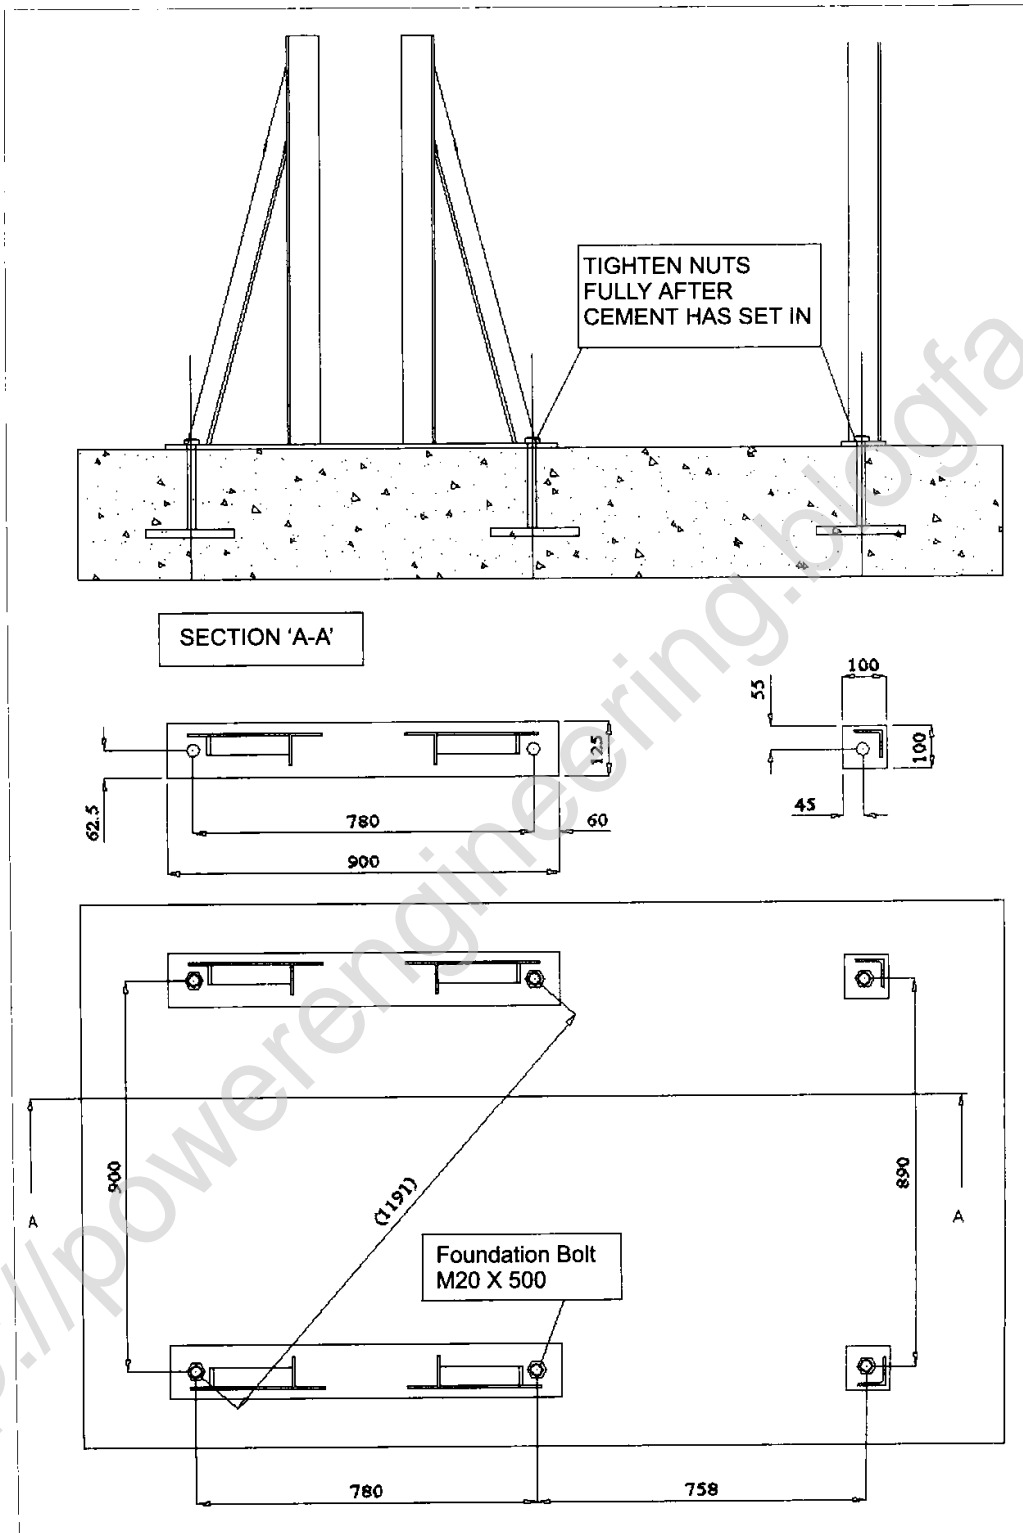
Foundation Plan for Outdoor Circuit Breaker with CT Structure
